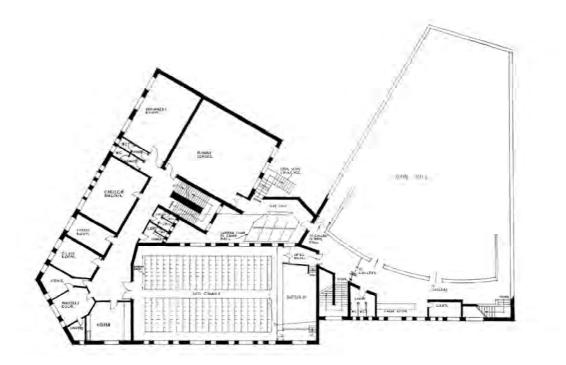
First Floor Plan of Archway Central Hall, 1934. Source: Archway Methodist Church
